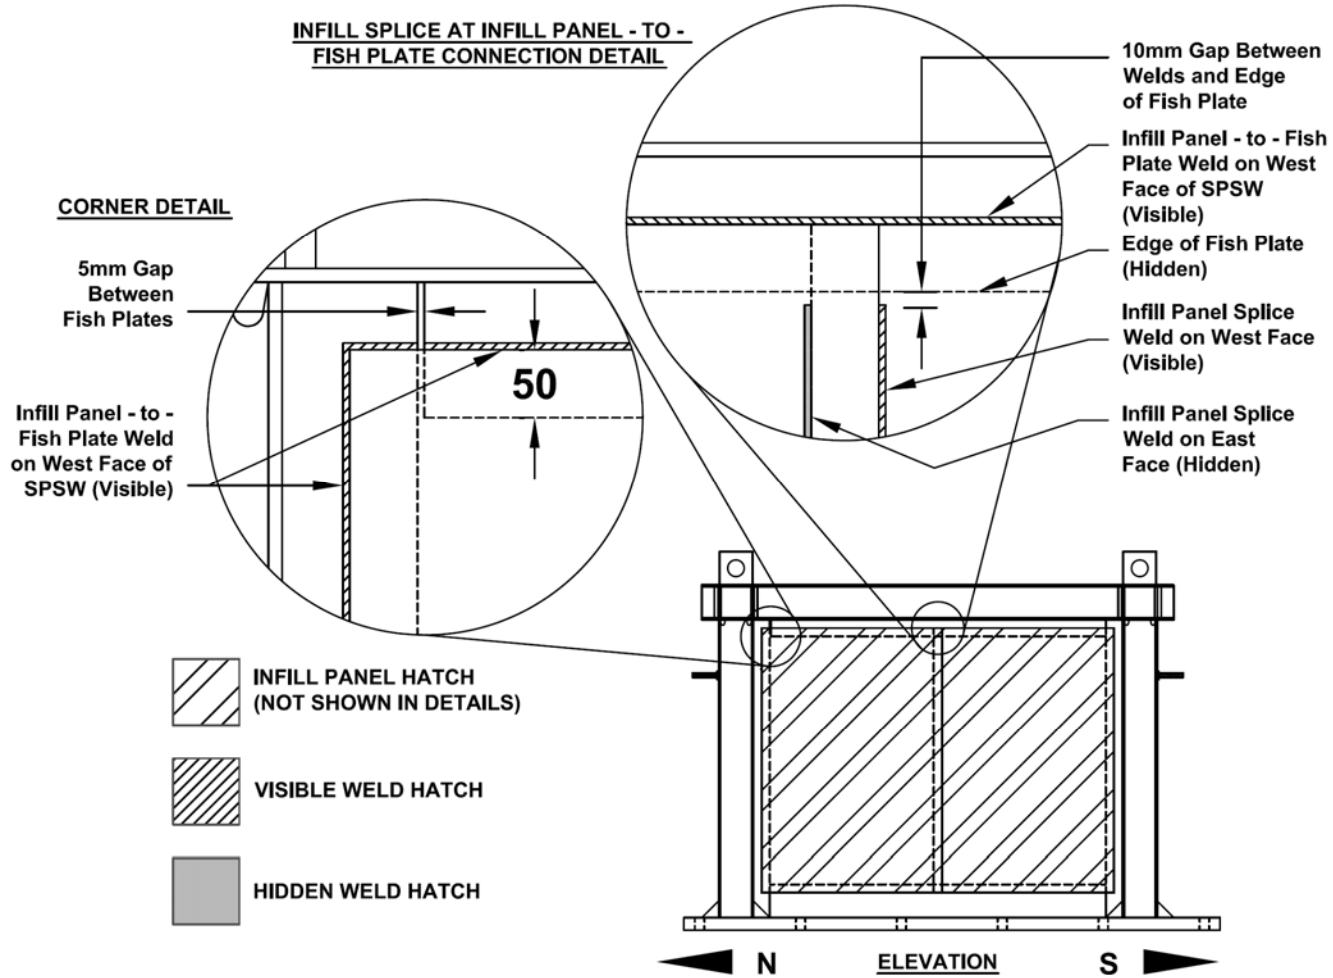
Particular Details for Infill Panel Welds
